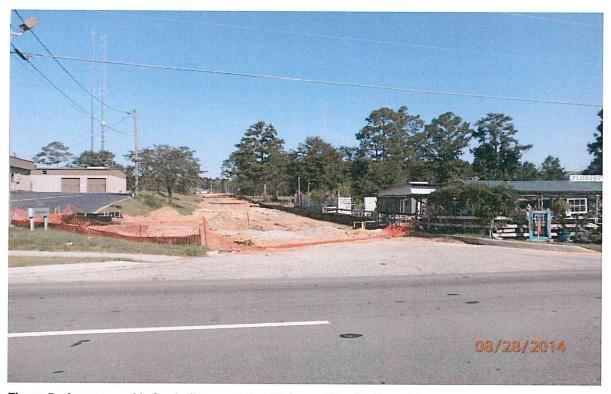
Access road being built connecting Highway 301 with the subject property to be deeded to the City of Statesboro as public right of way.
